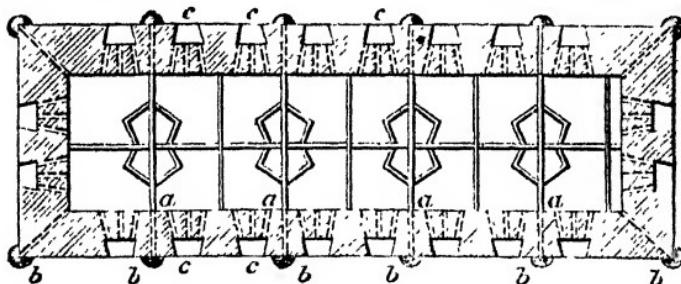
HORIZONTAL SECTION OF THE KILN EMPLOYED IN KERNEL ROASTING.
